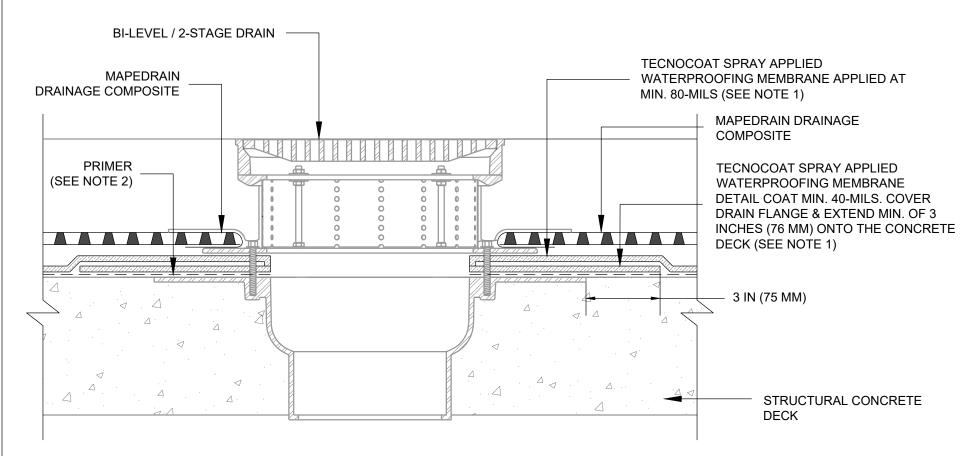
DETAILS ARE INTENDED TO BE A GUIDE FOR WATERPROOFING INSTALLATION ONLY
